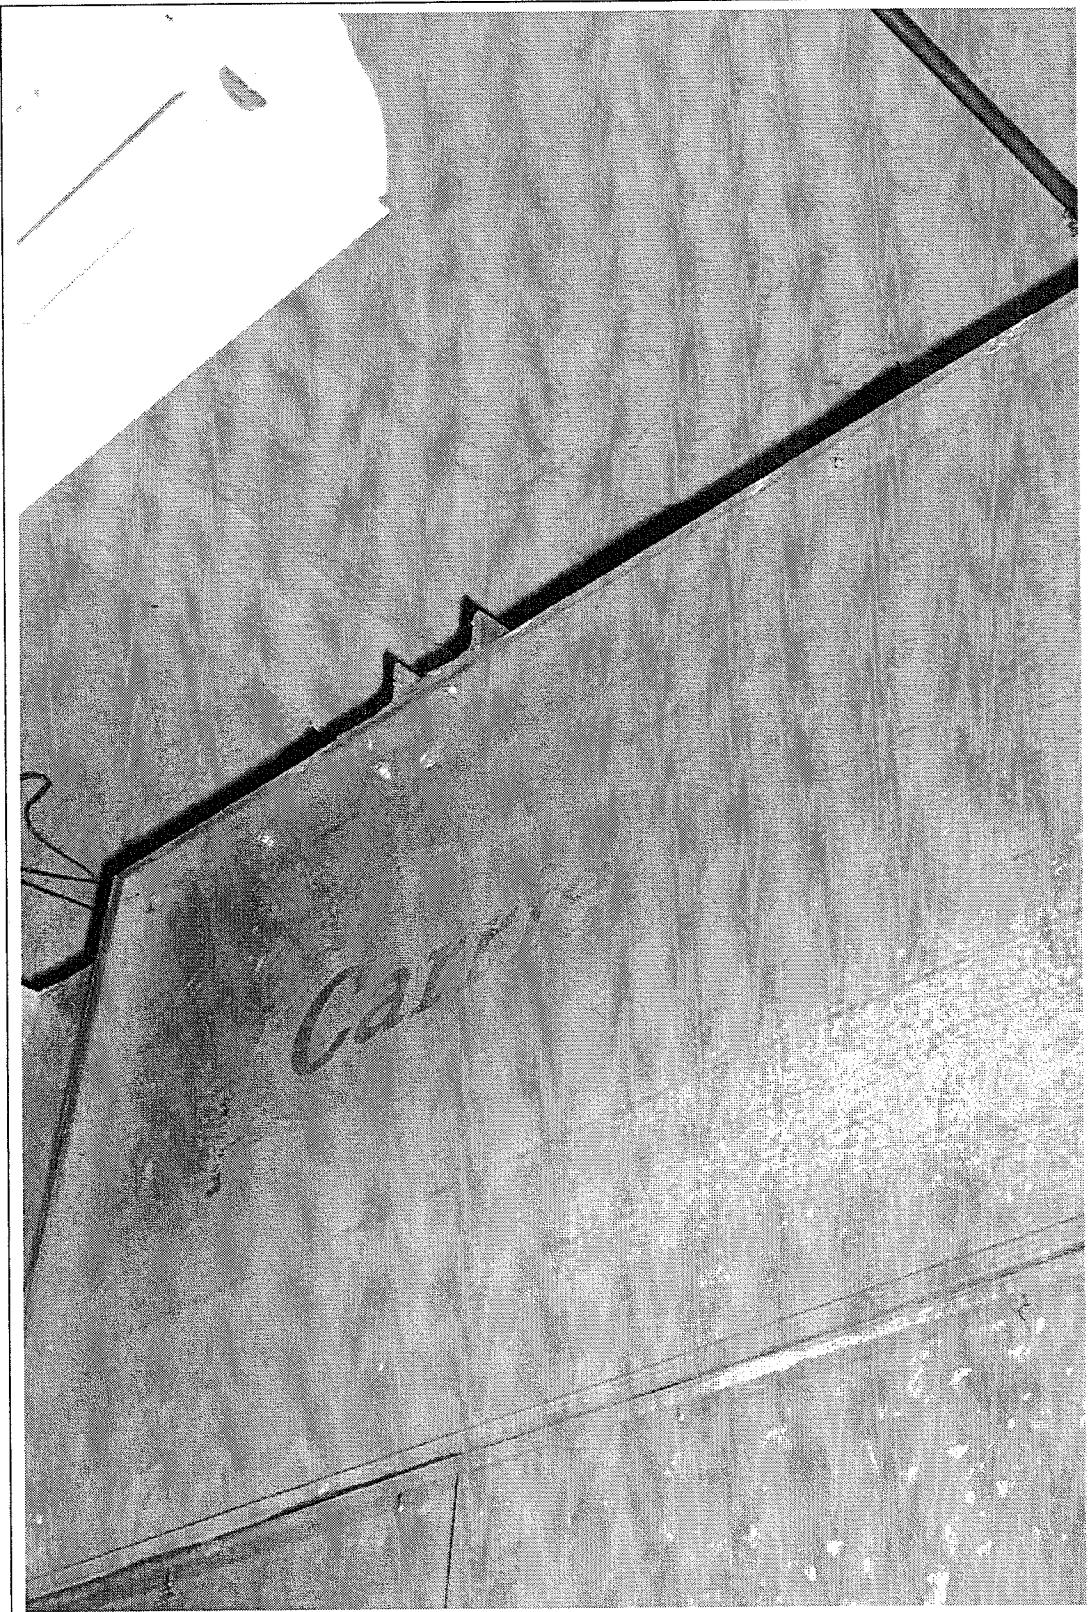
Main Terminal, 3rd floor, Air Handler Room - Exposed fireproofed decking above HVAC fan unit
